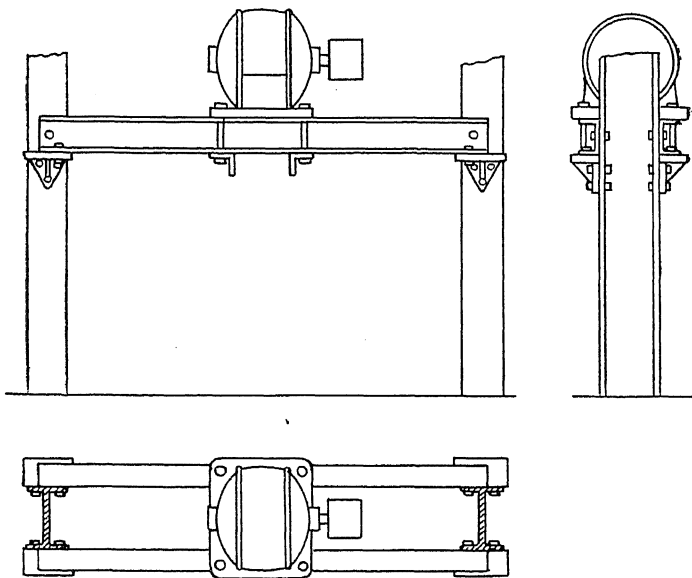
Method of supporting Motor between Two Steel Columns.
